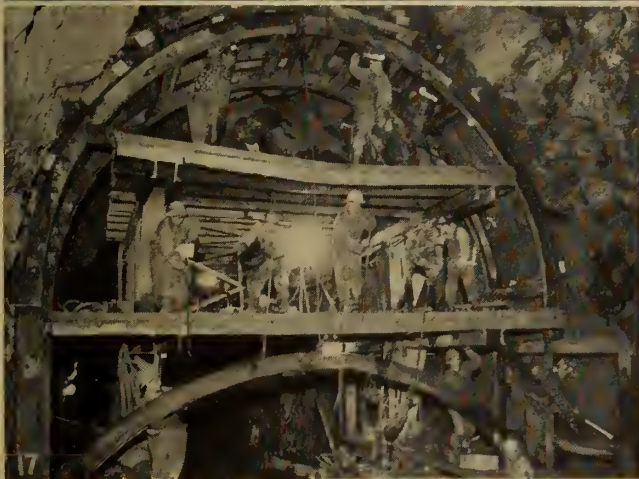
Three-deck drill jumbo, with platform folded to allow passage of muck cars, doubles as a "cherry picker" car hoist for moving empties over the train to serve the muck loader.
